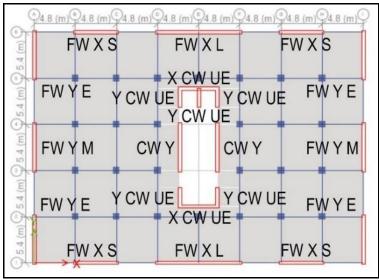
Walls position – plan view Slika 5. Pozicije zidova – presek u osnovi
